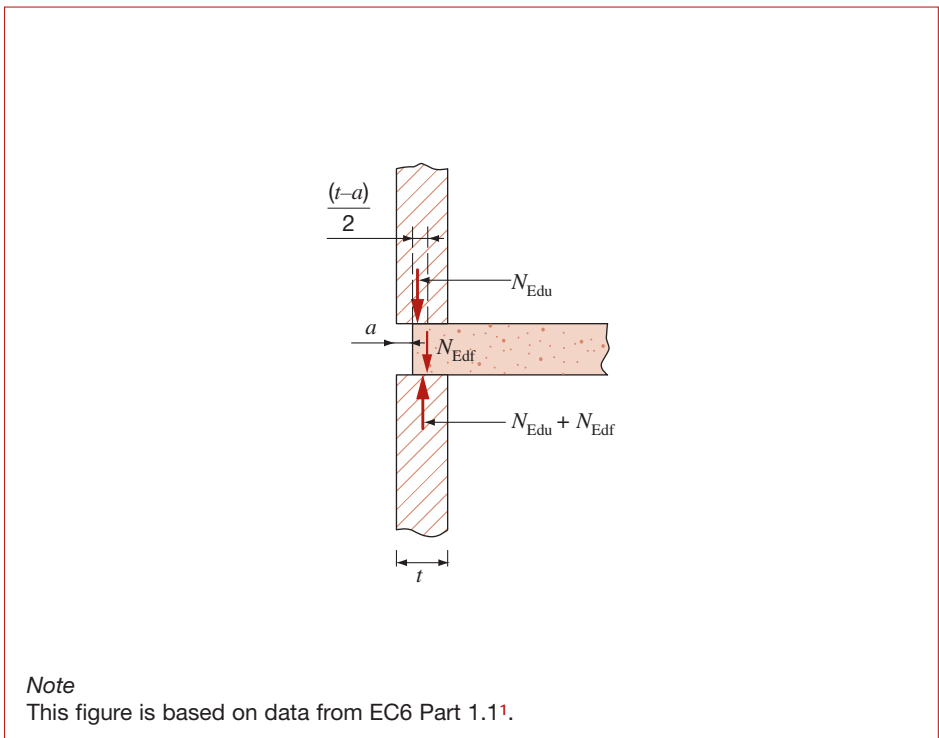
Diagram showing the forces when a floor is supported over a part of the thickness of a wall
